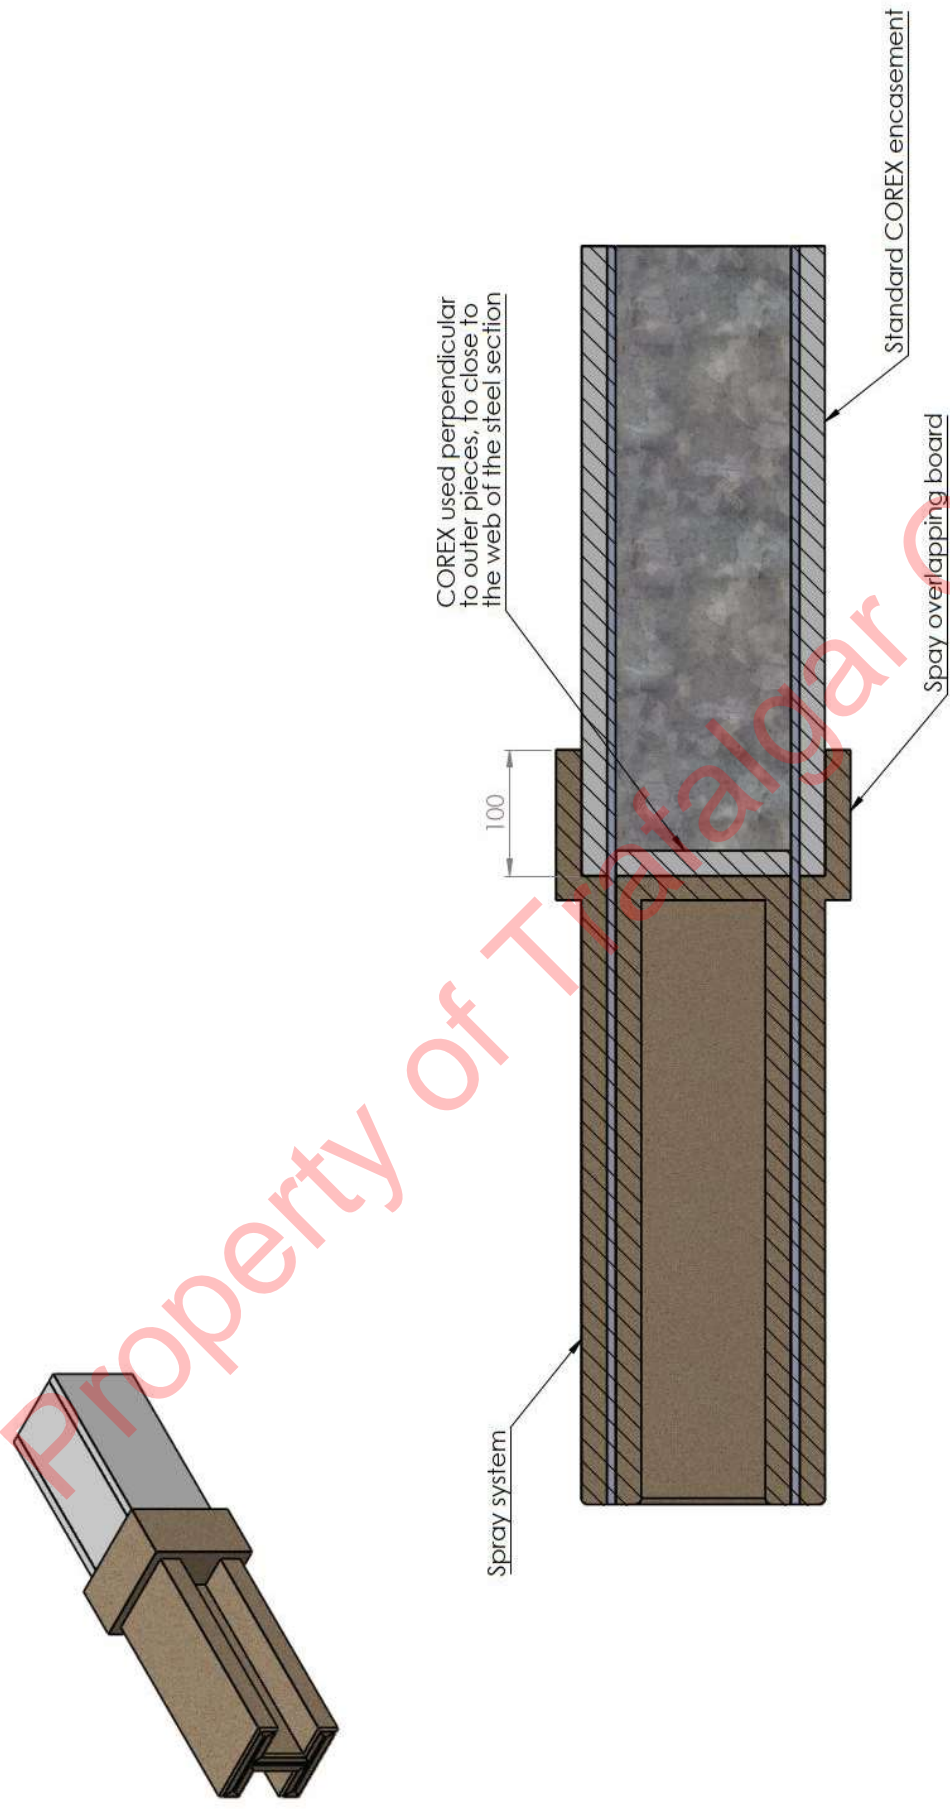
The construction detail when the spray protection system is added next to the existing board protection system – Option 1
